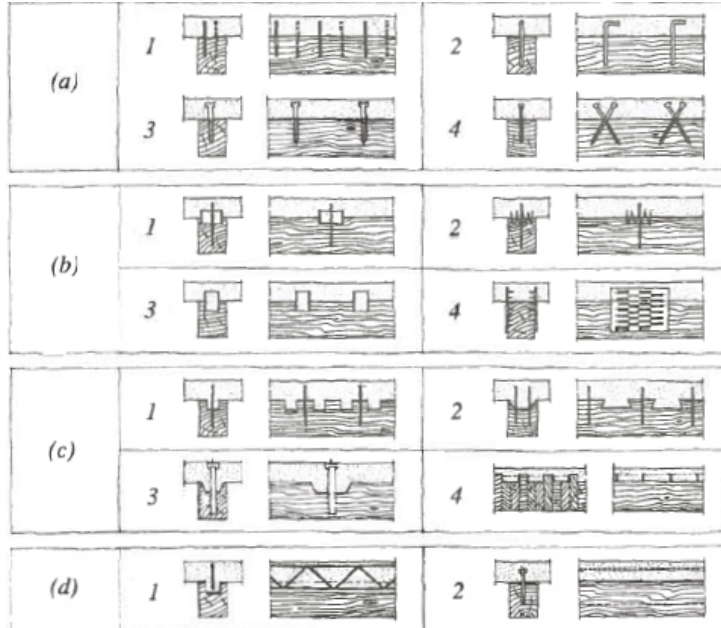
Examples of different shear connectors: (a1) nails; (a2) reinforced concrete steel bars; (a3) screws; (a4) inclined screws; (b1) split rings; (b2) toothed plates; (b3) steel tubes; (b4) steel punched metal plates; (c1) round indentations in timber and fasteners preventing uplift; (c2) square indentations and fasteners; (c3) cup indentations and prestressed steel bars; (c4) nailed timber planks deck and steel shear plates slotted through the deeper planks; (d1) steel lattice glued to timber; (d2) steel plate glued to timber.
